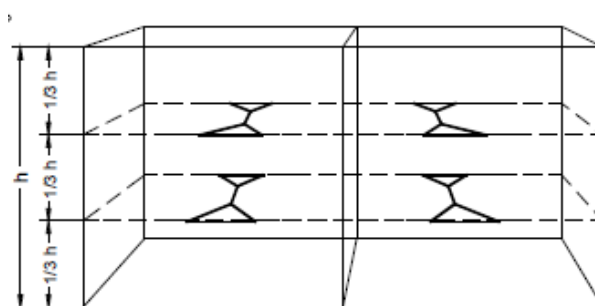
Horizontal cross bracing (or stiffeners) to limit the bulging of the exposed gabion face (Maccaferri)
